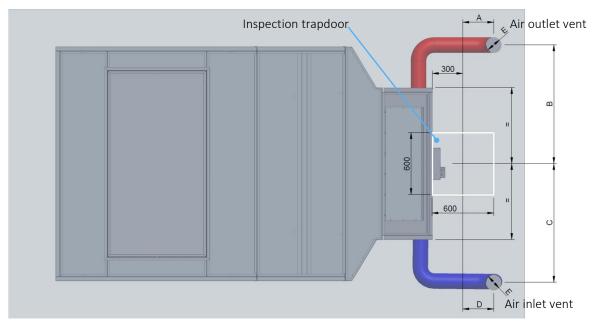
Layout of the inspection trapdoor and ventilation system: view from below
